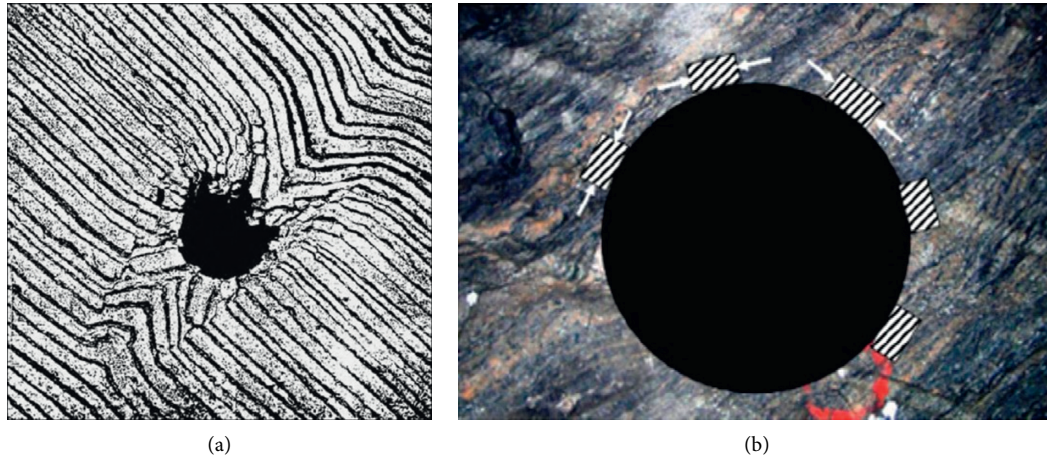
Failure mode and stress state of layered rock surrounding a wellbore or tunnel. (a) Wellbore failure in areas of steep, thin circulating zones [1]. (b) Stress states around a tunnel in a layered rock mass [4].
